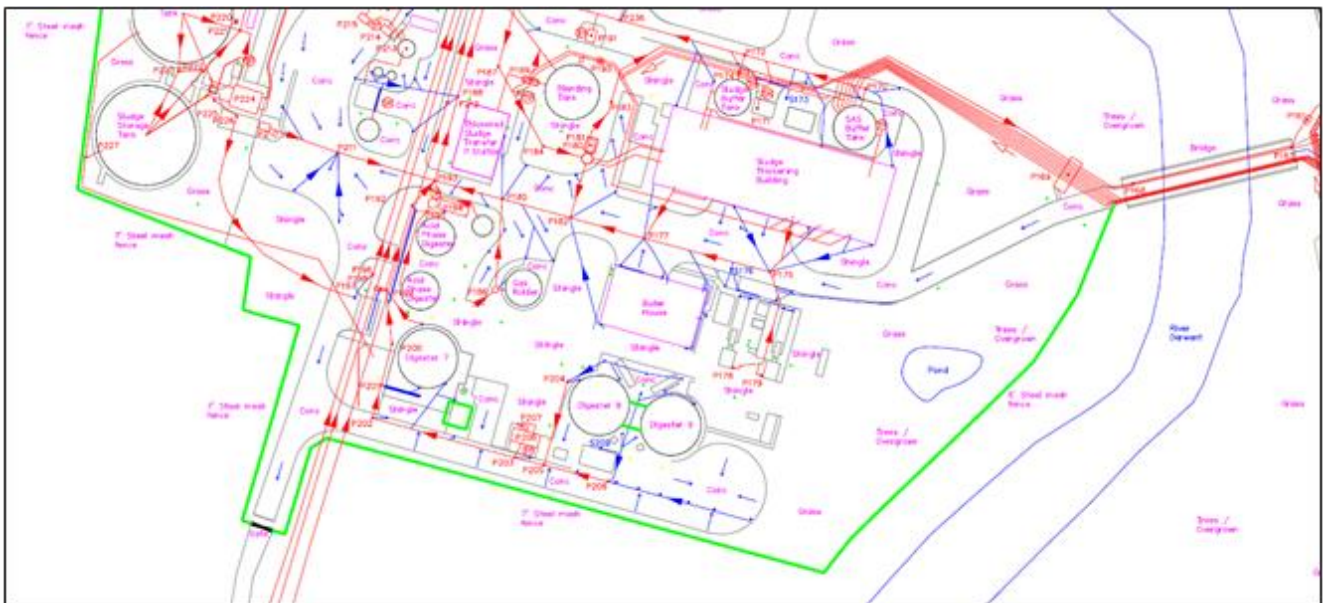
Bioresources Area surface water drainage – Plan 2 of 2
